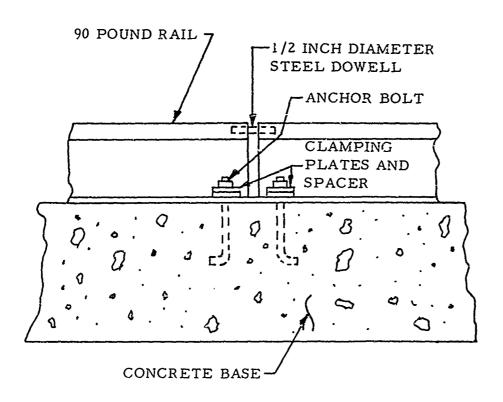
TYPICAL RAIL JOINT TIEDOWN
